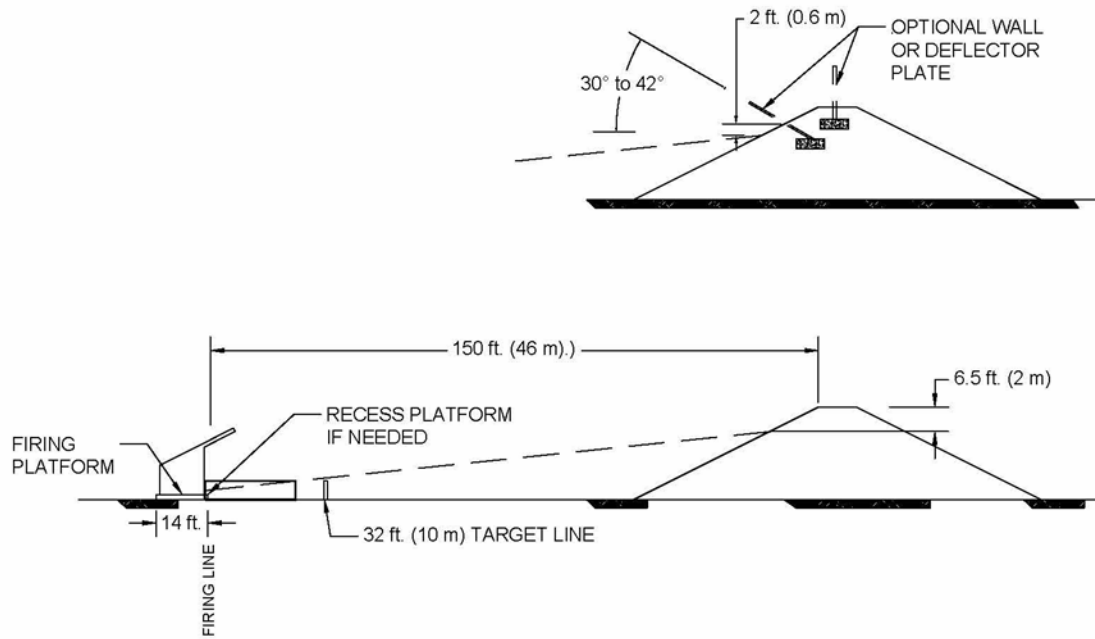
Machine Gun 10-Meter Tube Range Section
